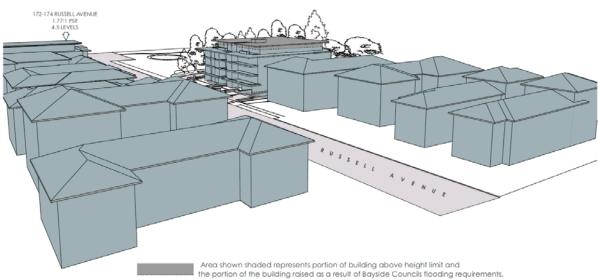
Street perspective looking west (Source: Proponent's Planning Proposal)
